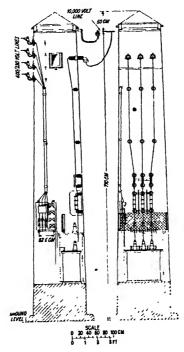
A Sheet Steel and Angle Iron Transformer Tower.
